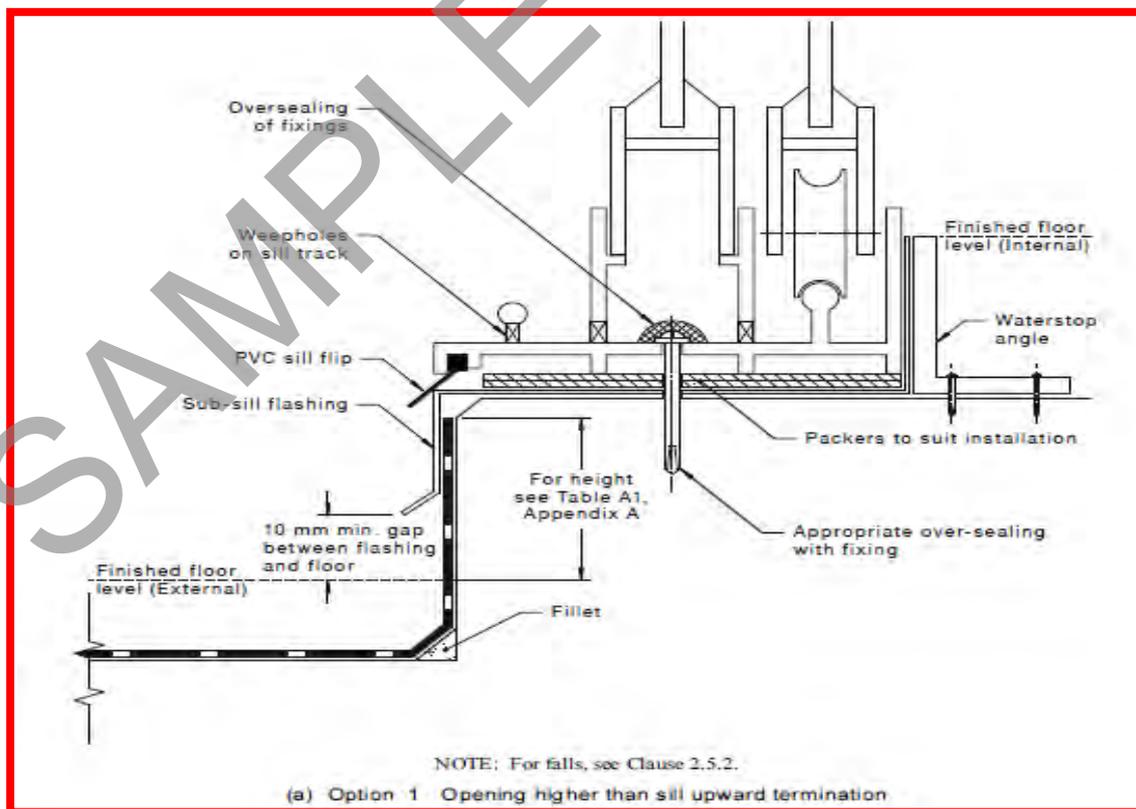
Figure 2.8 (in part) Typical Details Of Membrane Termination At External Opening Doors.
